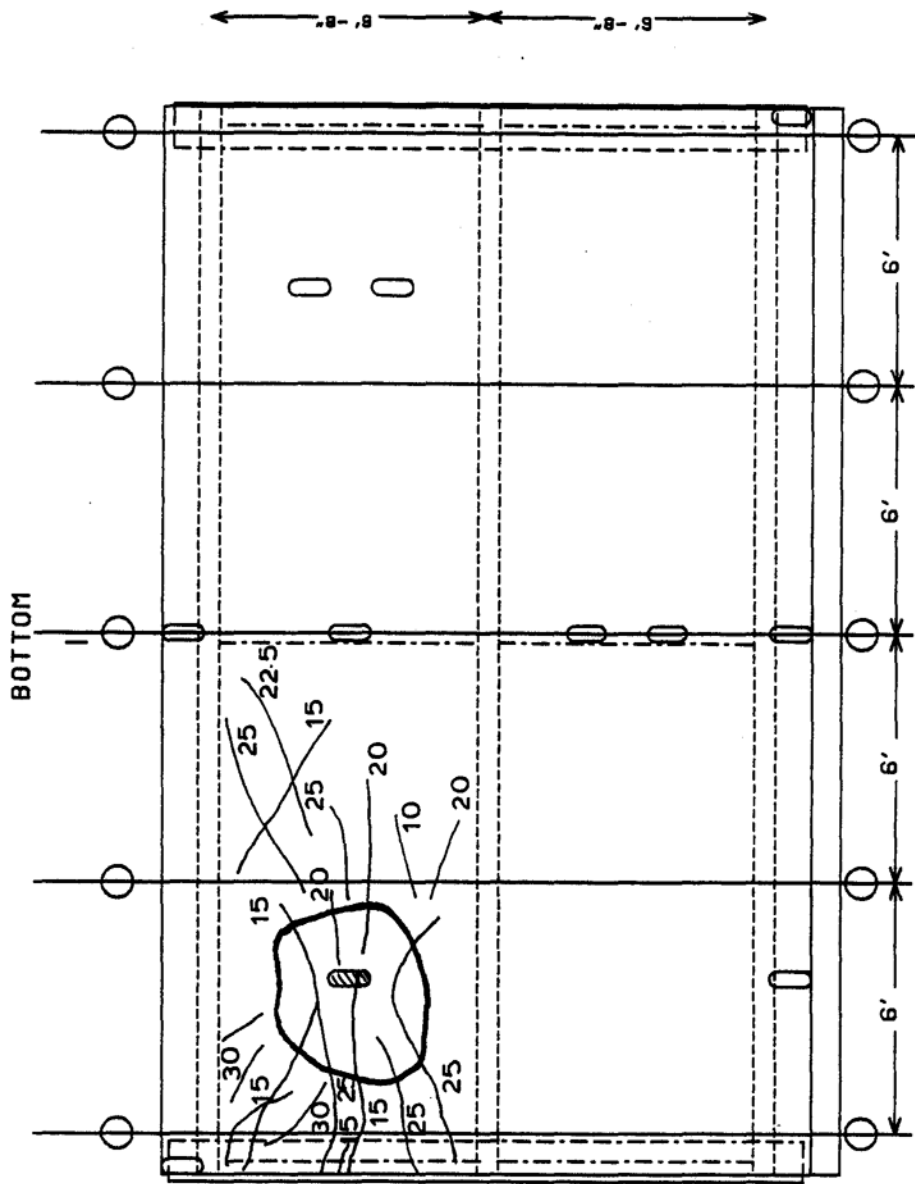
Bottom Cracking Pattern (First Bridge - Test No. 8)
